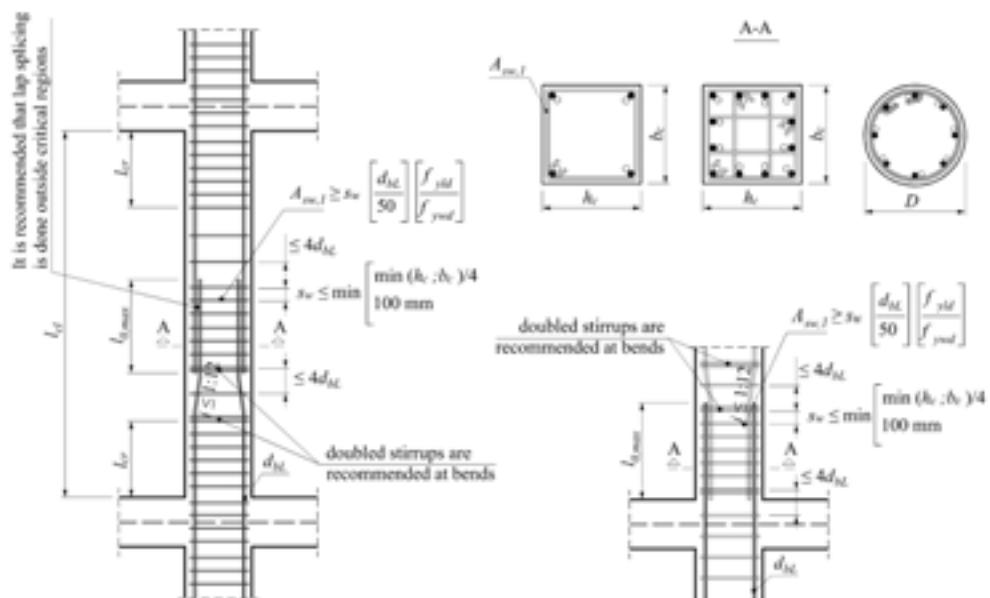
Transversal reinforcement detailing requirements over the splicing length of the longitudinal reinforcement
